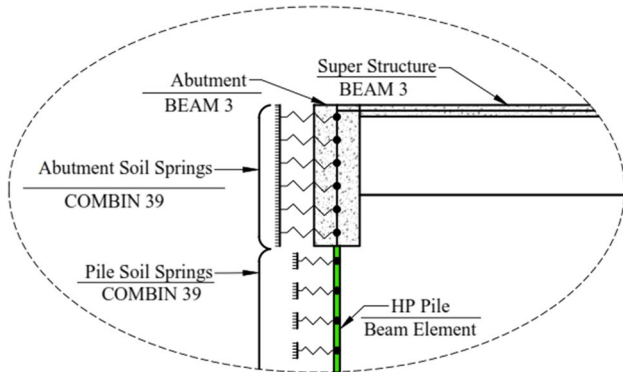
Soil–structure (pile, abutment, back wall) interaction view
